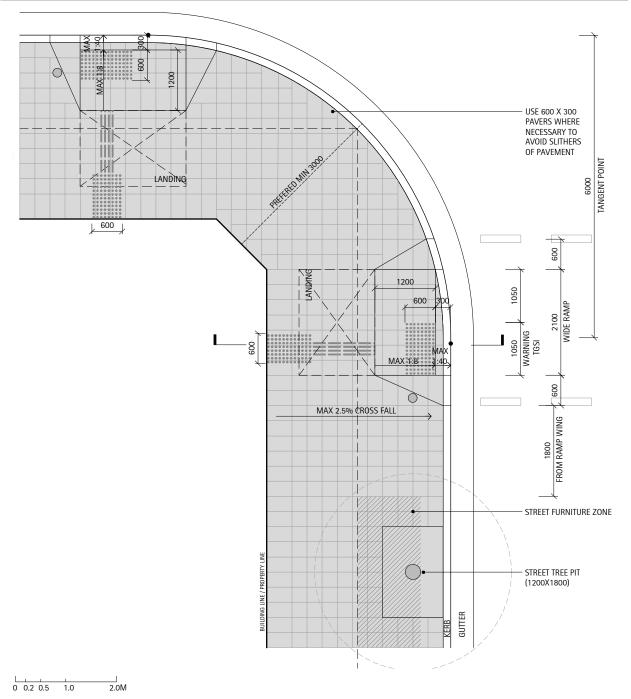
Streets Corner Plan: 6000 Radius 2100 Ramp
